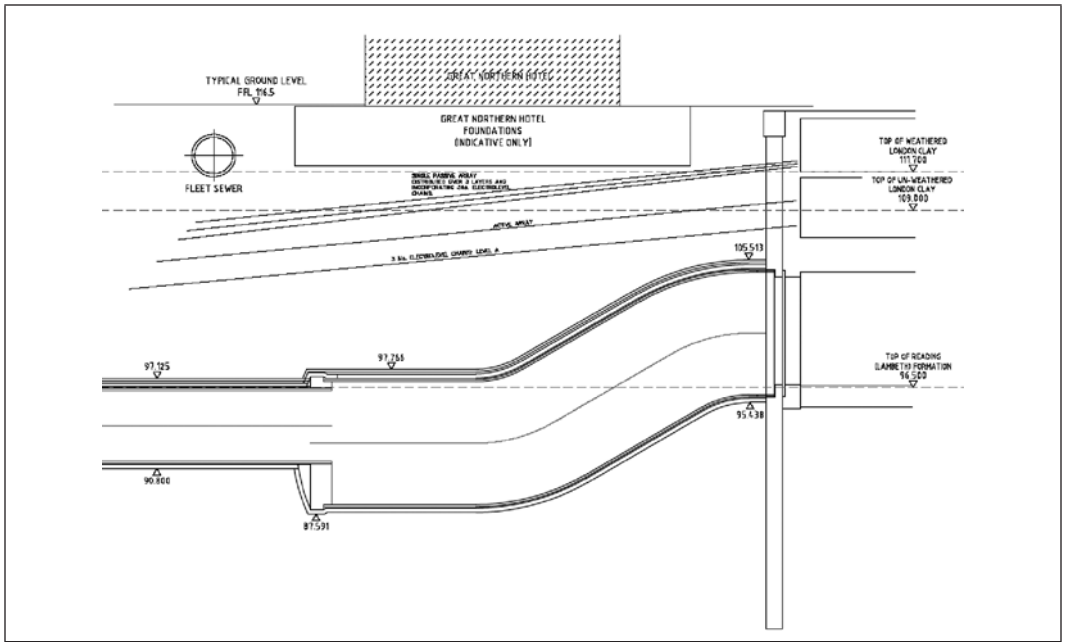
Longitudinal section with compensation grouting pipes at NLA
